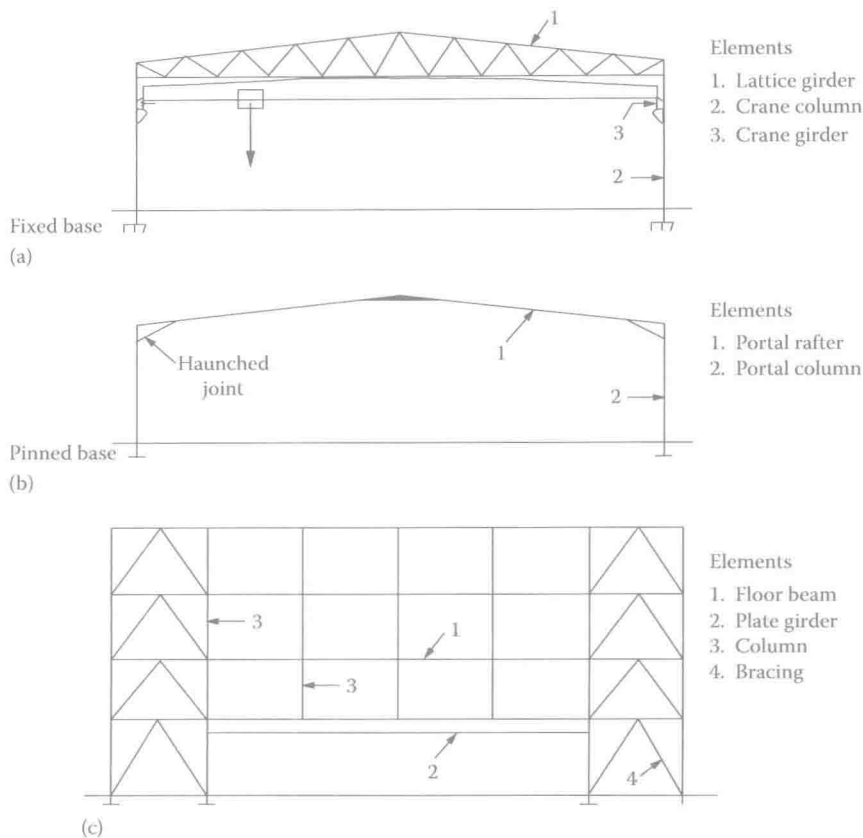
Three common types of steel buildings: (a) single-storey lattice roof building with crane; (b) single-storey rigid pinned base portal; (c) multistorey building.
